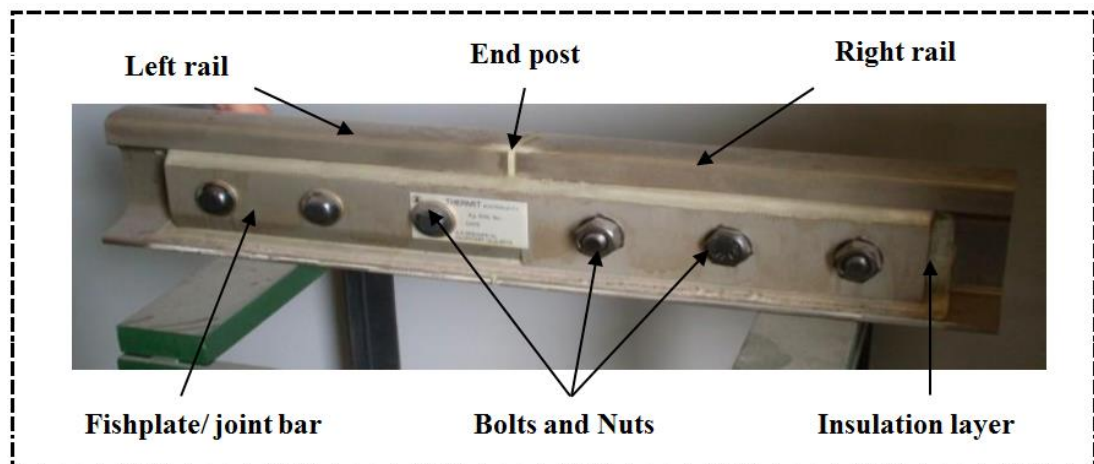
An insulated rail joint with 6-bolt joint bars used in Australia
